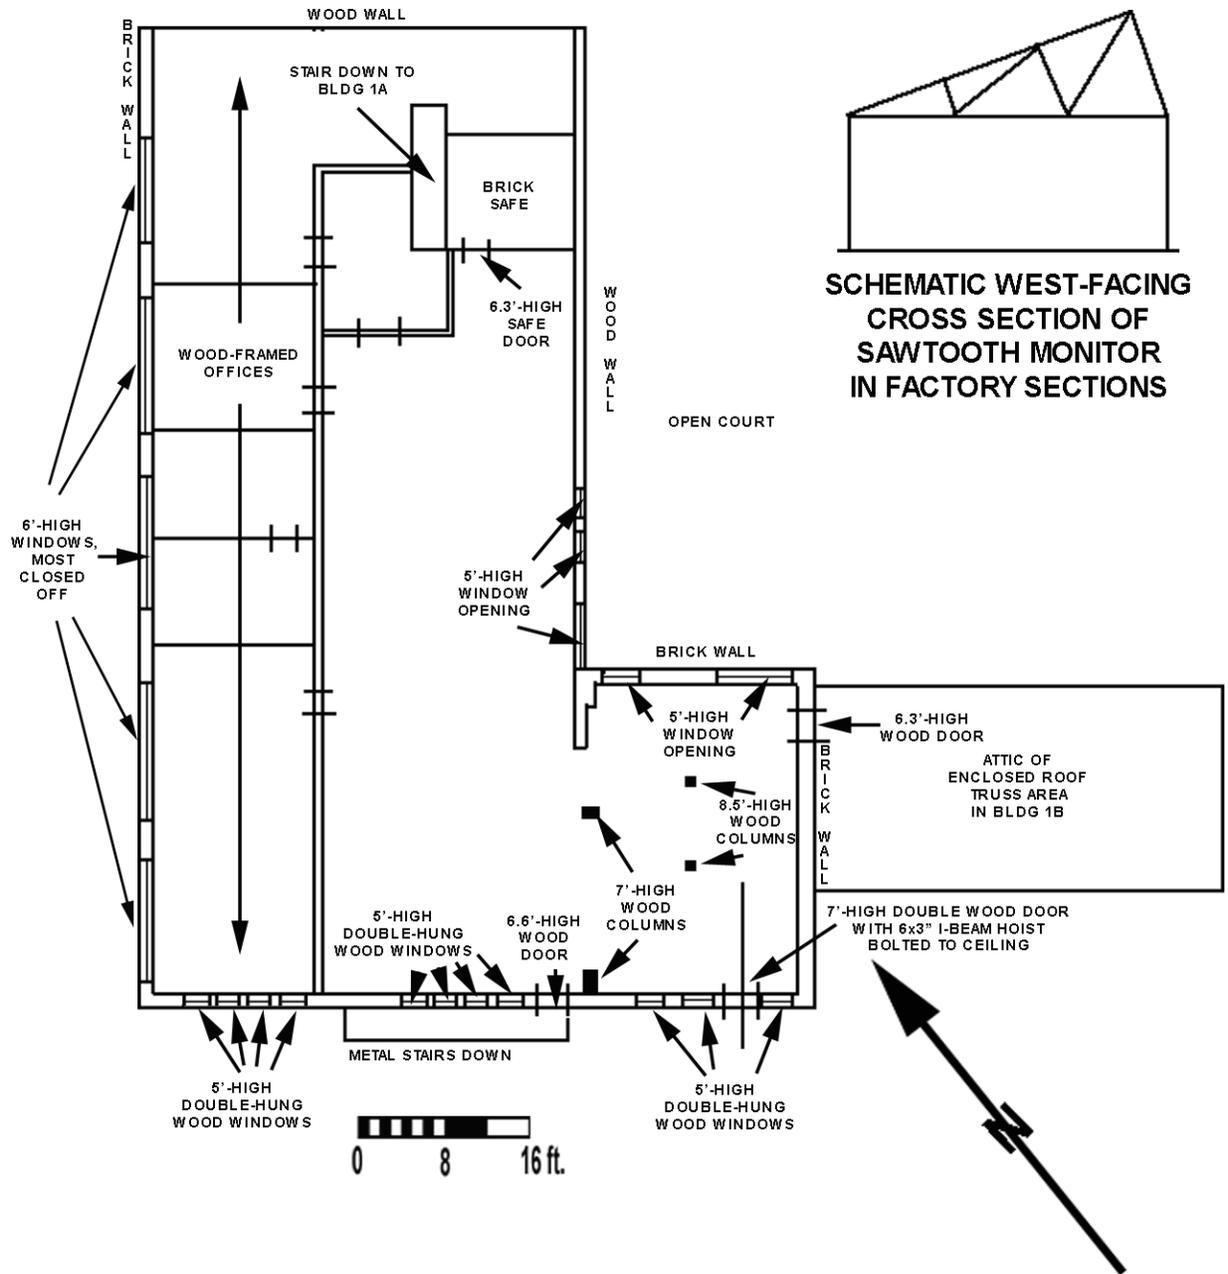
SKETCH PLANS OF 2007 SECOND FLOOR CONDITIONS, AND MONITOR ROOF CROSS SECTION
